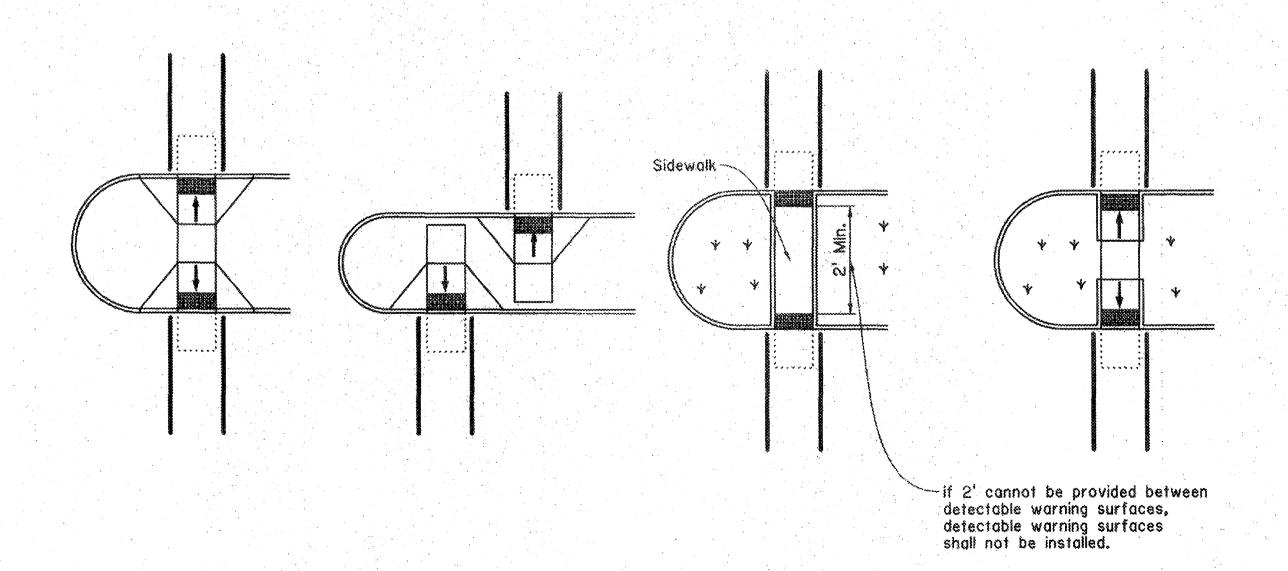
DETAIL E: CURB RAMPS PLACED AT MID-BLOCK CROSSING
